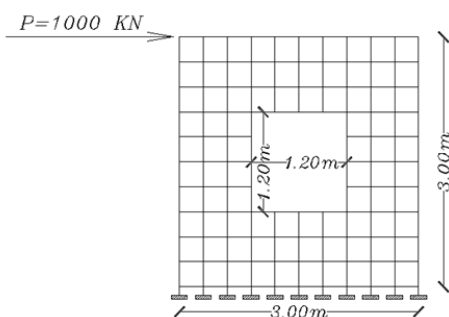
C-W12 3×3m cantilever wall model with central window opening
